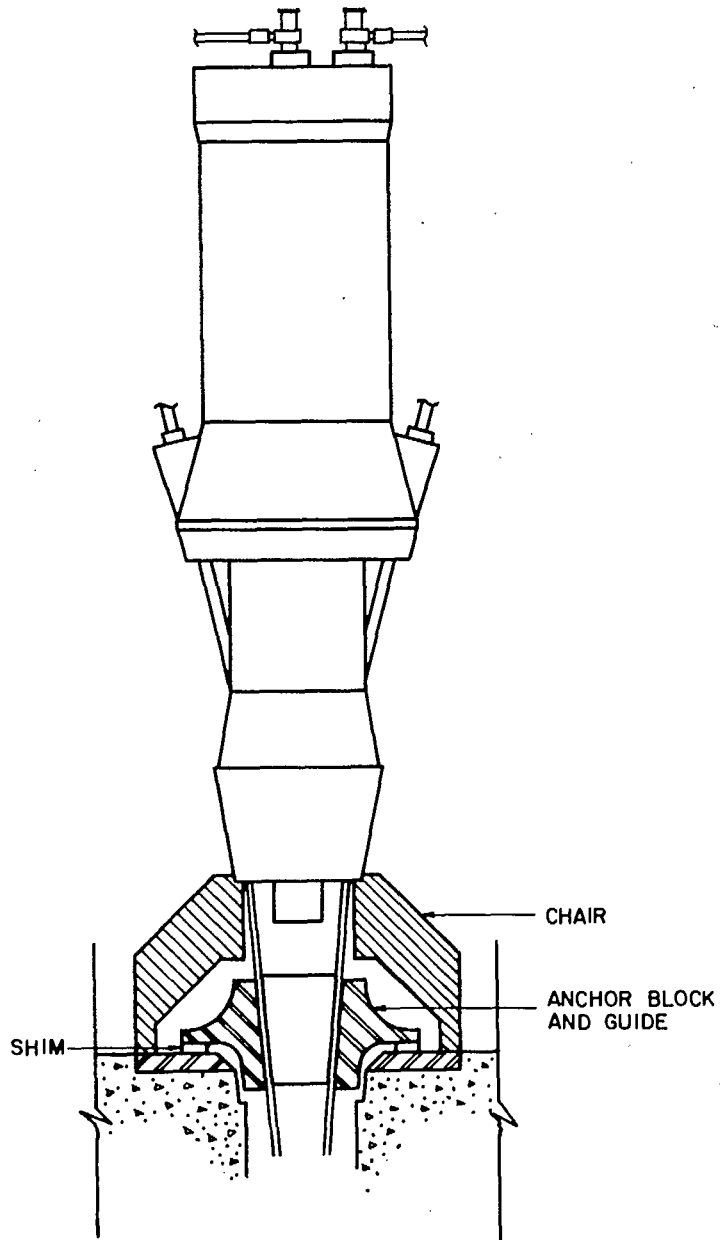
Jack Arrangement for Shimming a Cable Rock Anchor.
